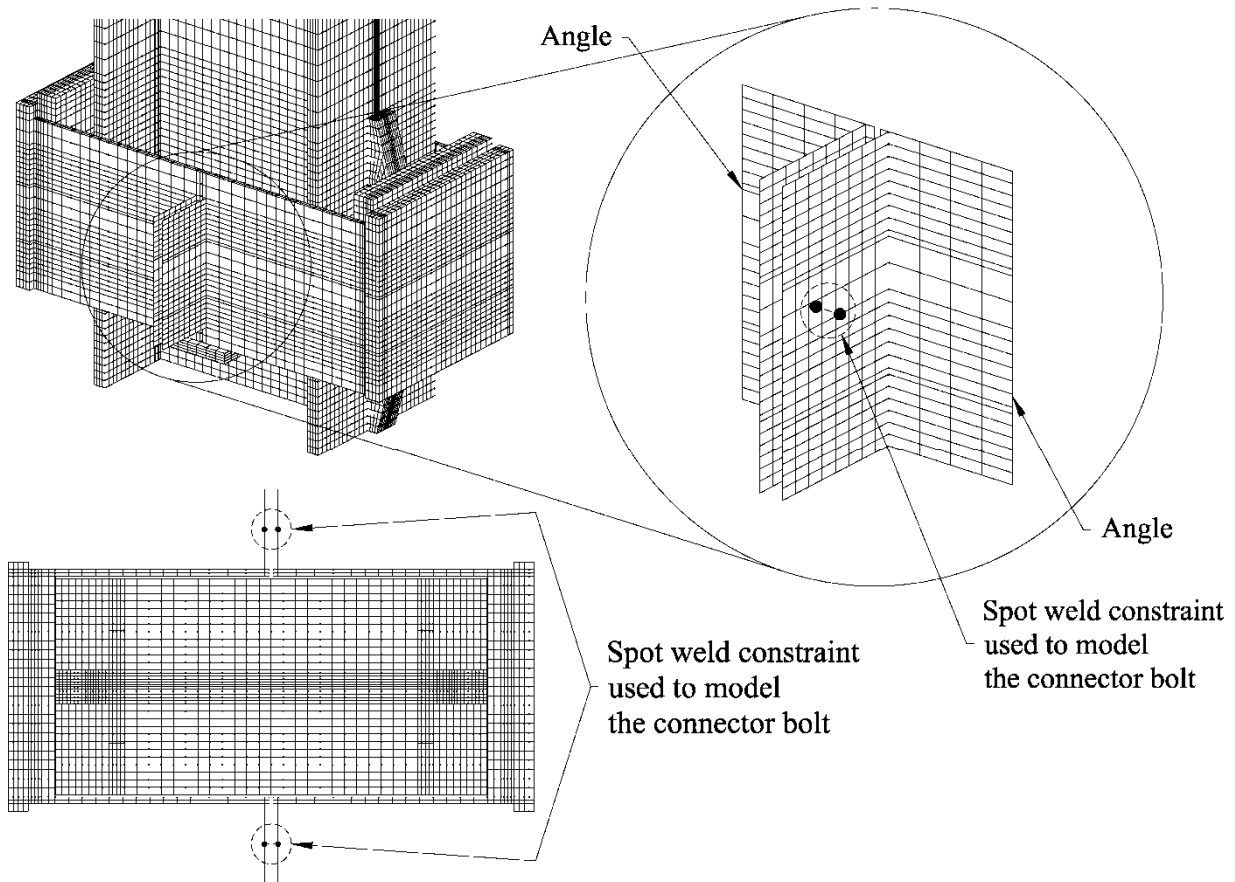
Spot weld constraint representation of connector bolts
